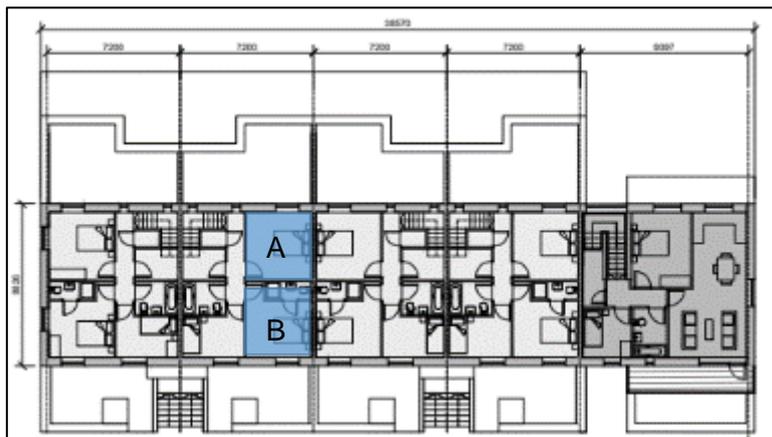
Block B – Second Floor Assessed Rooms Highlighted in Blue
